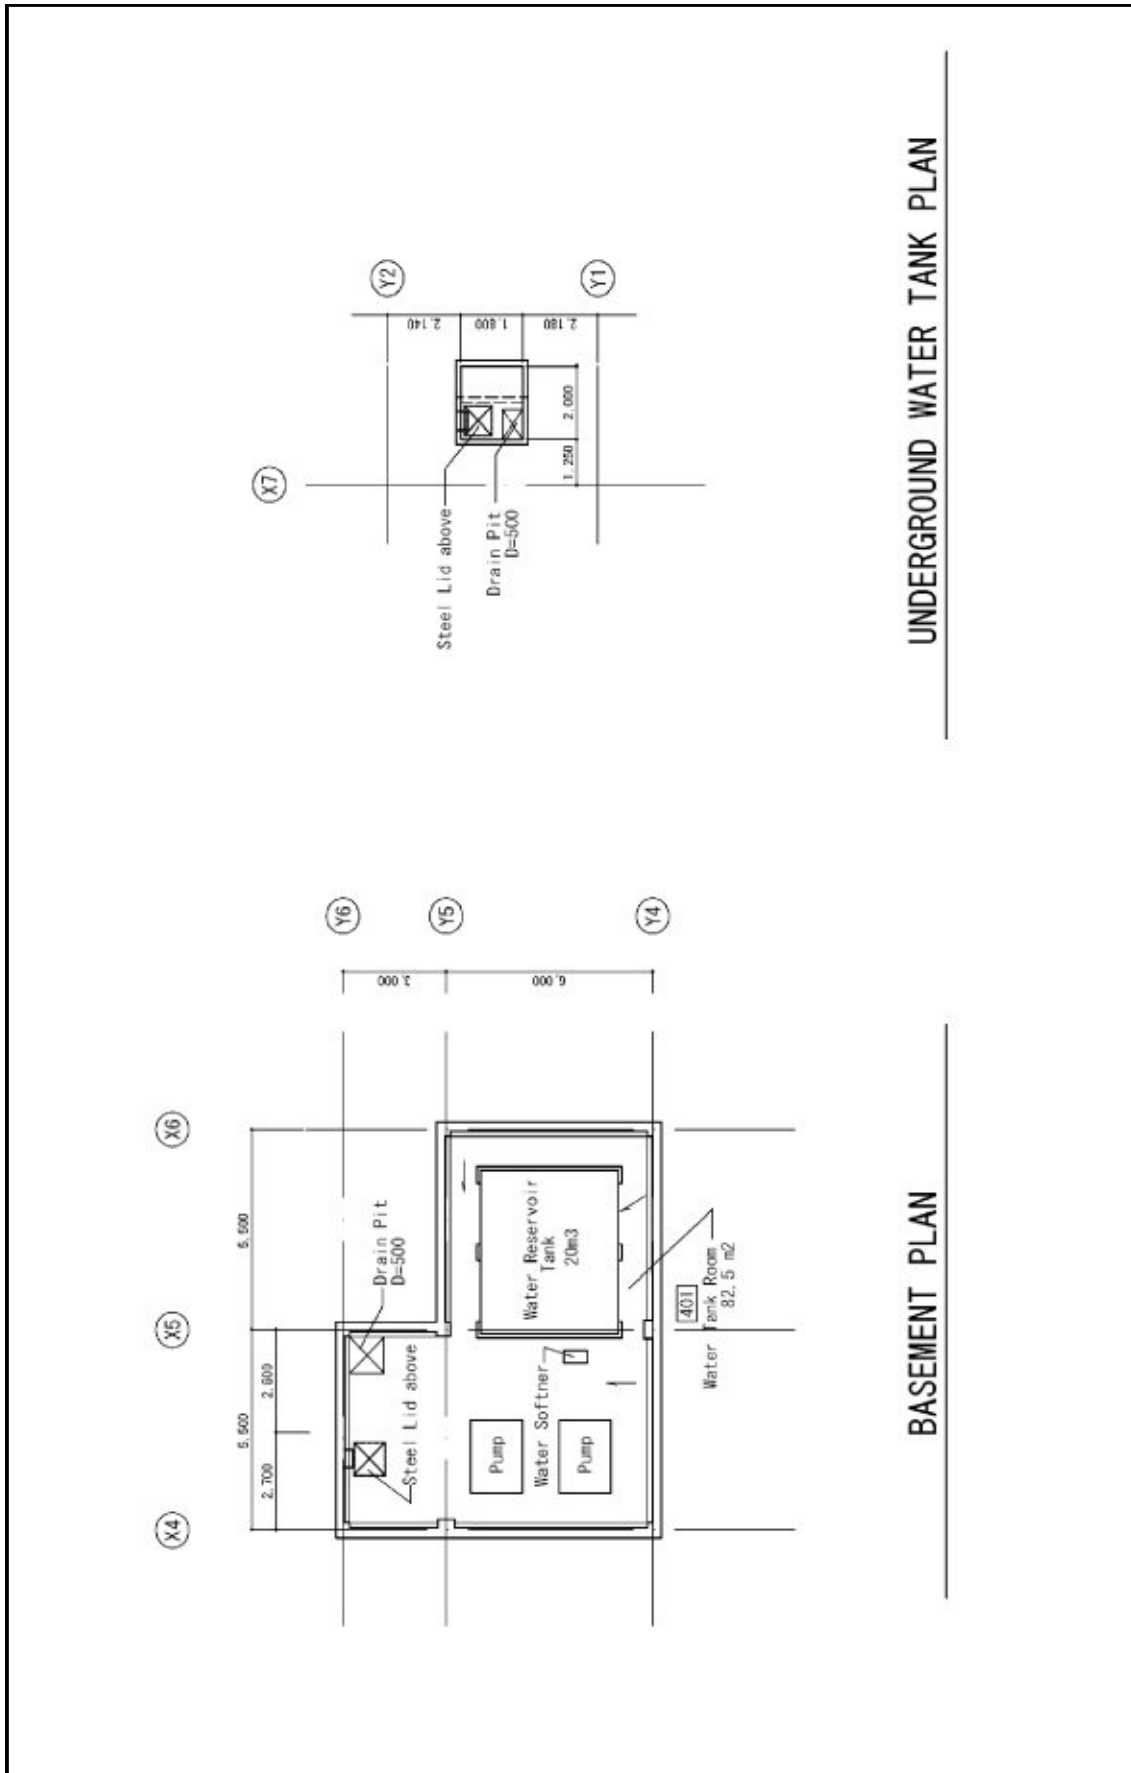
(16) Layout of New Fisheries Center (Basement)
